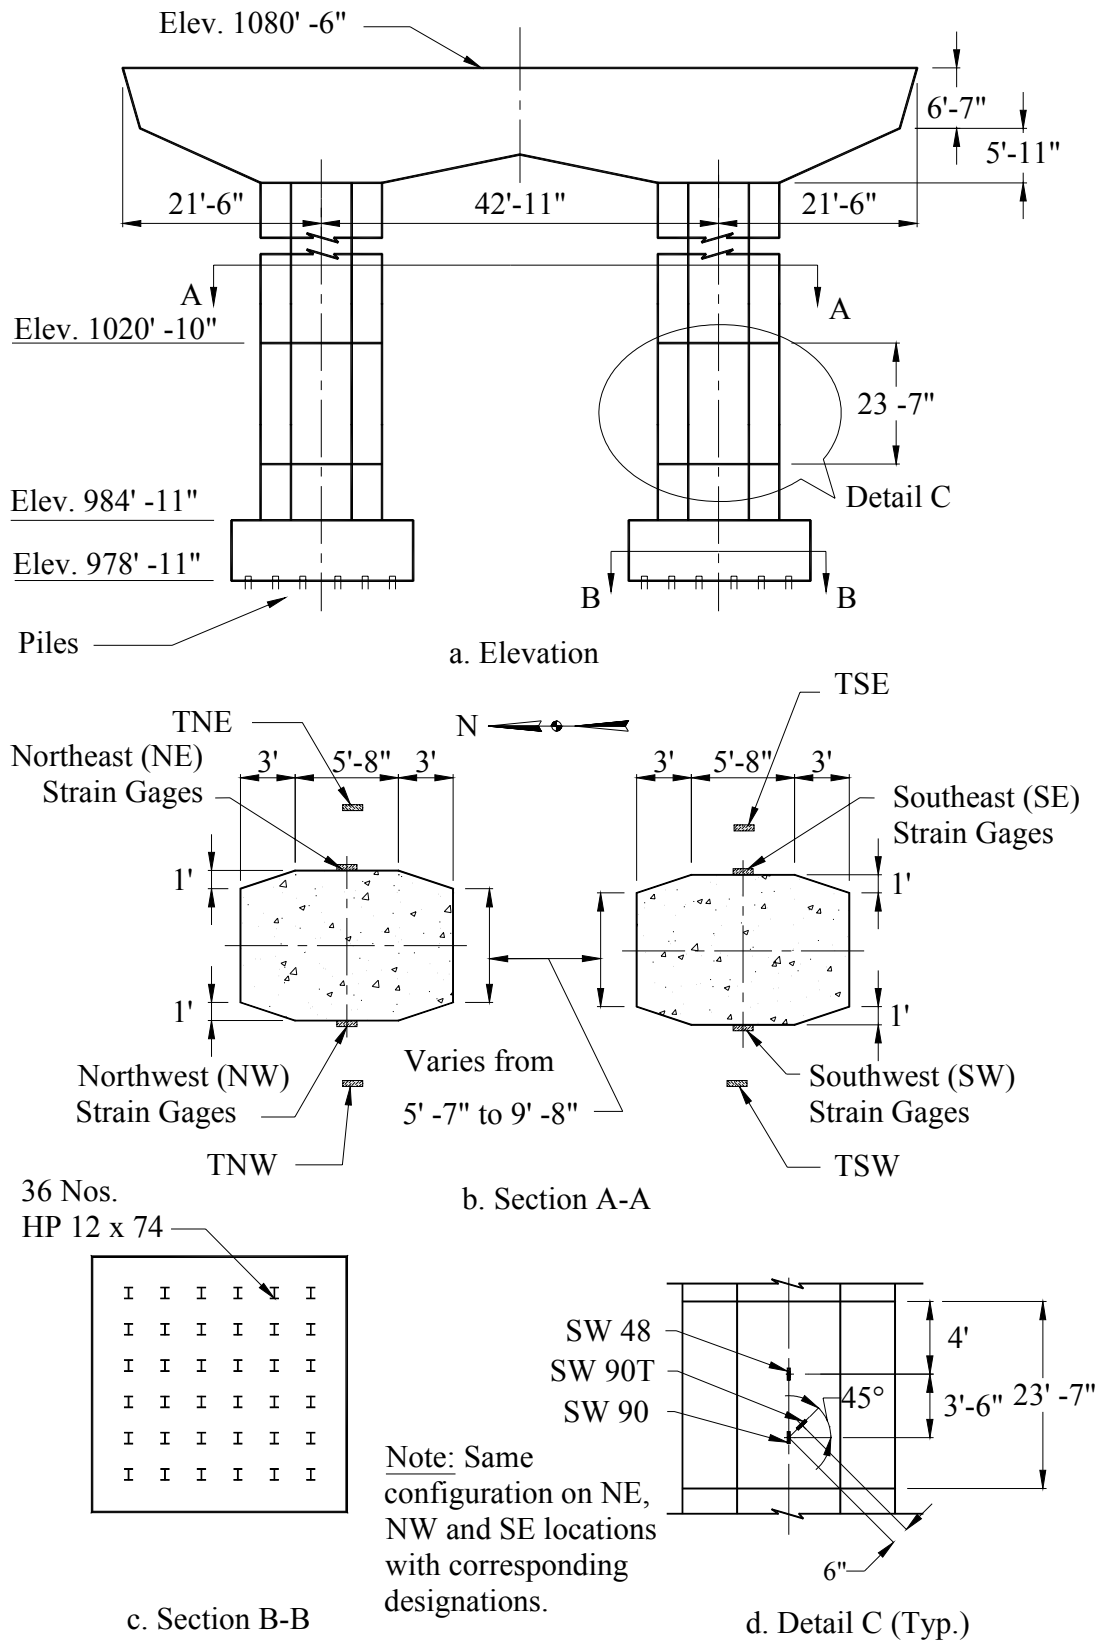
Instrumentation of Pier 2 – Launch EB4.
